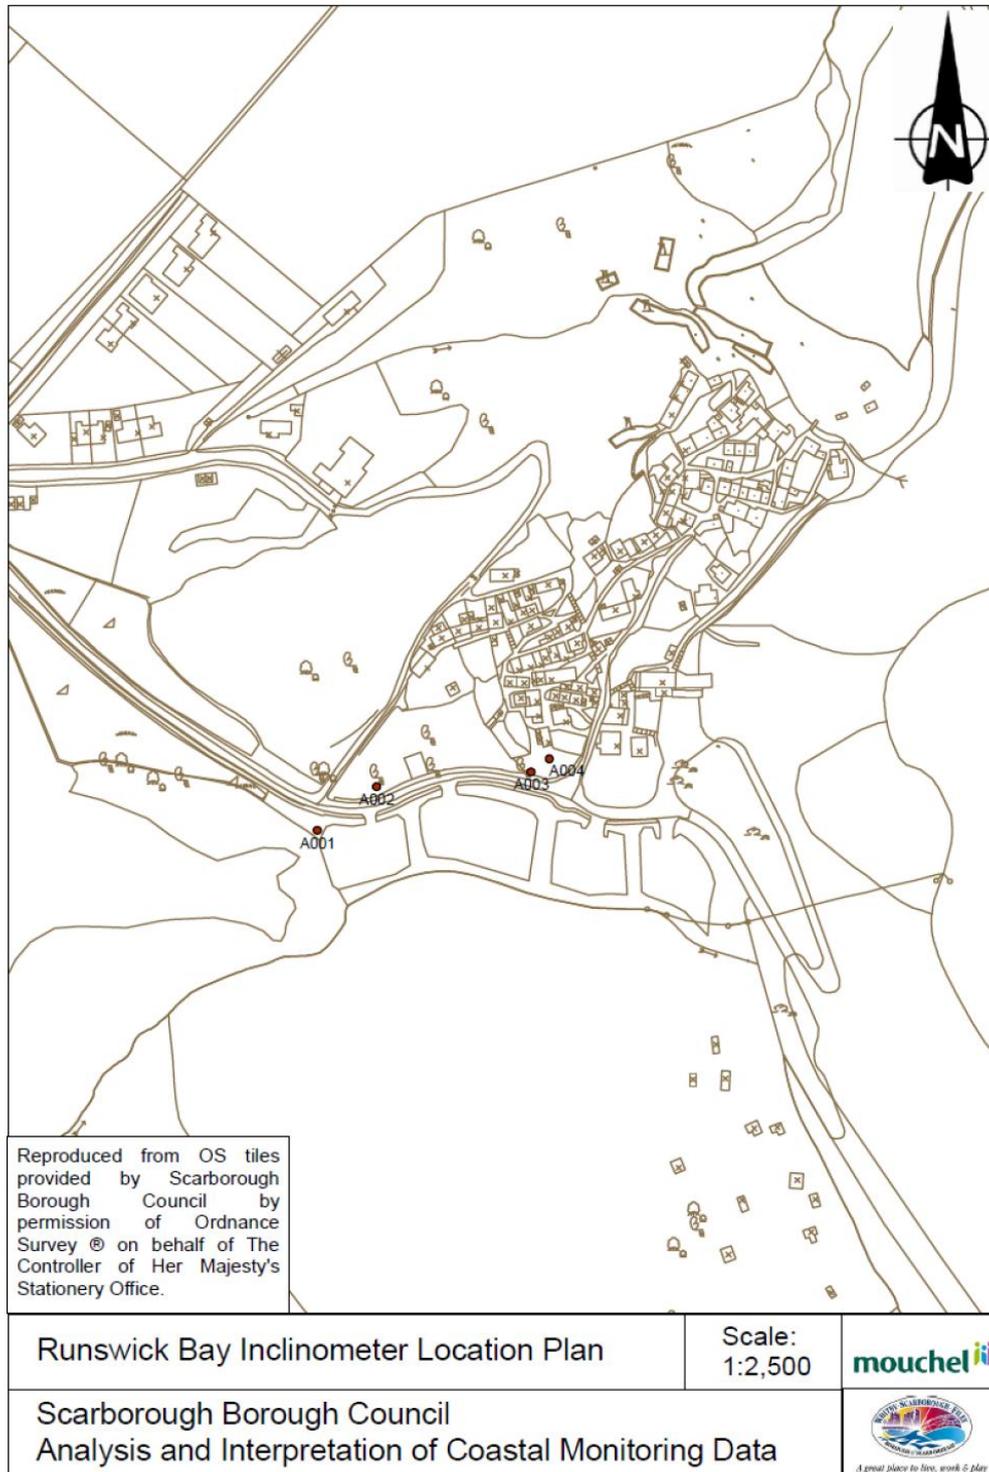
Location Plan for Inclinator at Runswick Bay
